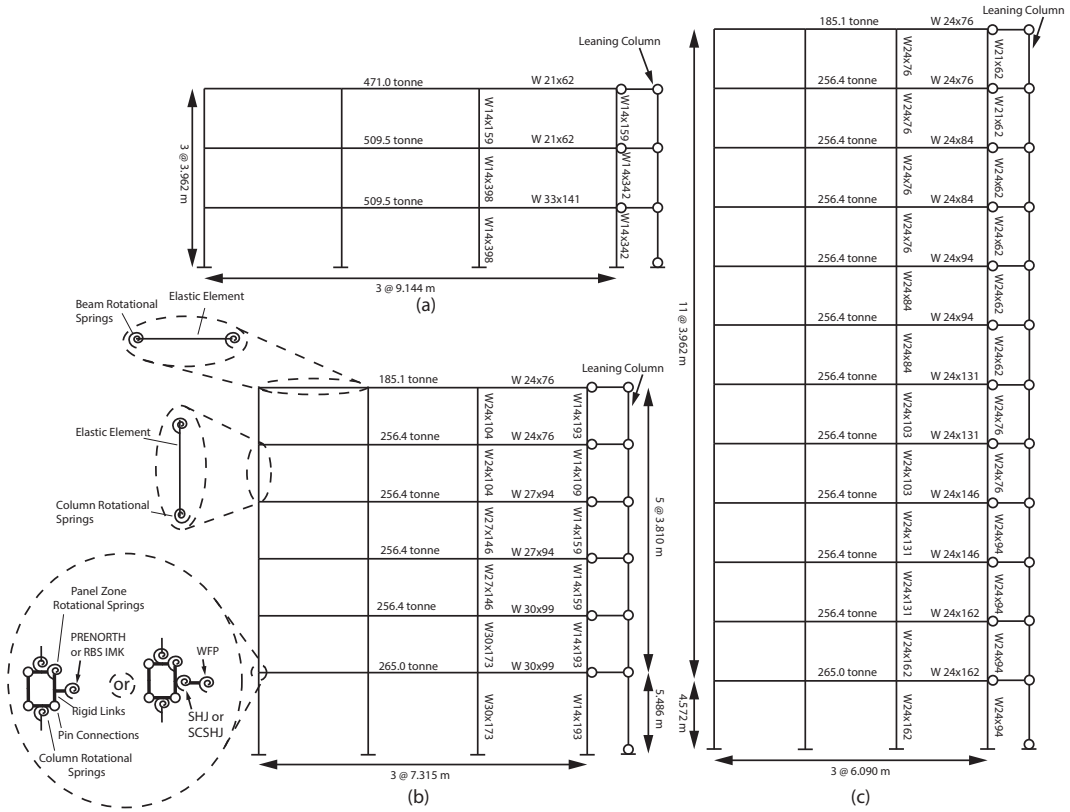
Layout of (a) 3-story frame, (b) 6-story frame with modeling detail and (c) 12-story frame
